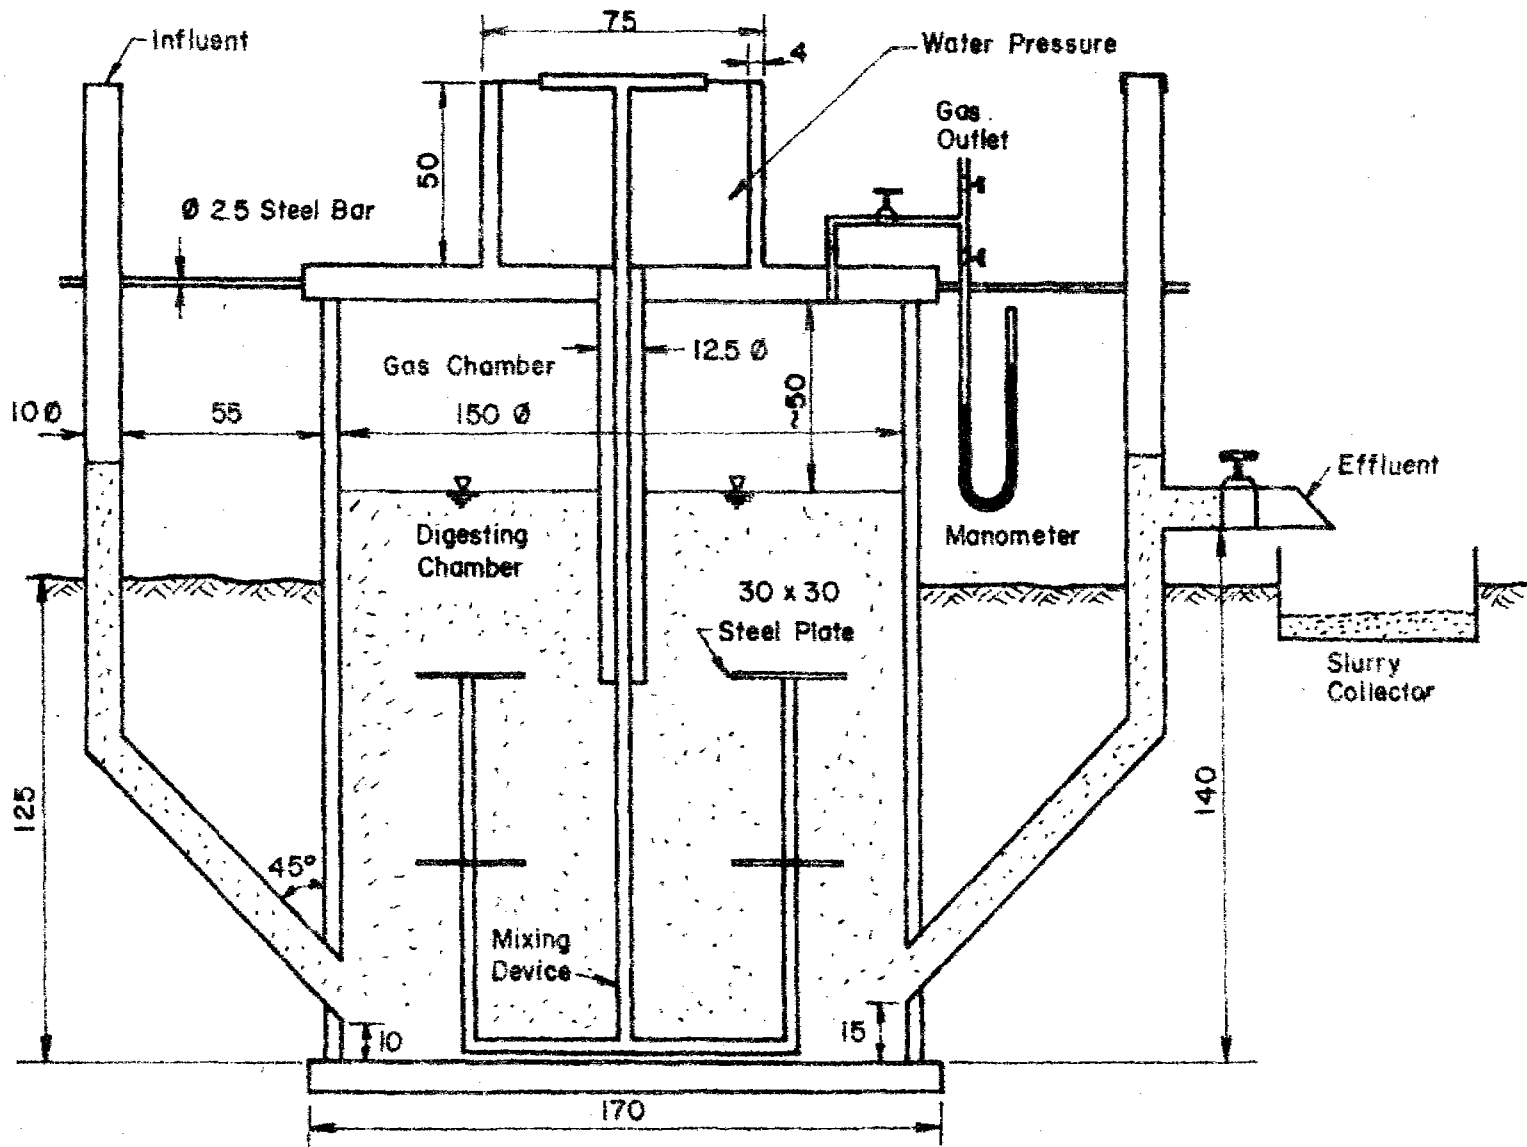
Detail of Ferrocement Biogas Digester (Dimensions in Centimetres. Scale 1:20)
